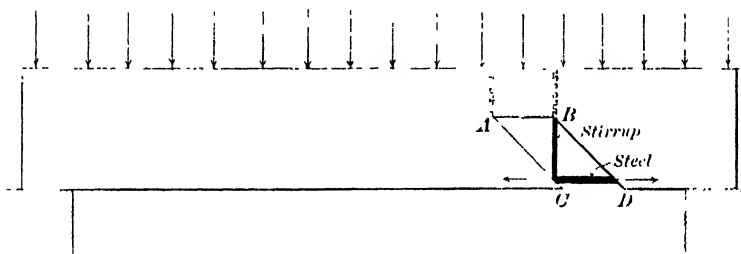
Beam with Break near End, illustrating Action of Vertical Stirrup. (See p. 446.)
